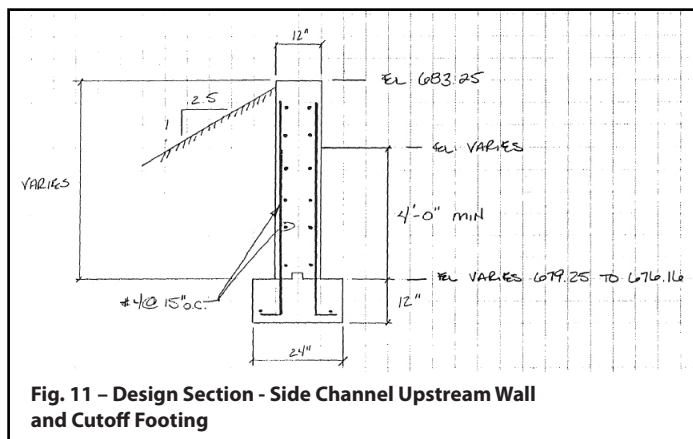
Design Section - Side Channel Upstream Wall and Cutoff Footing
